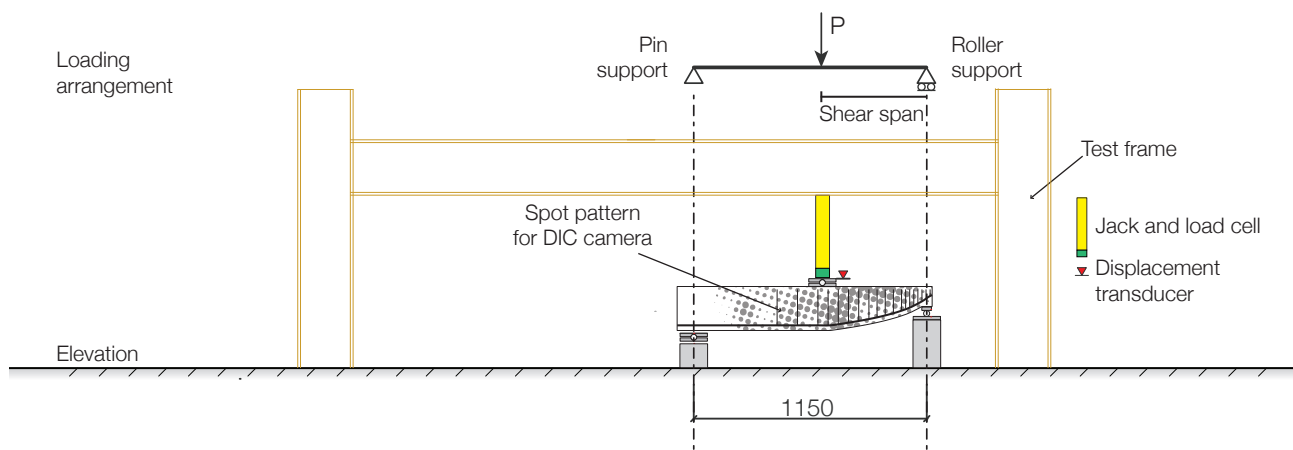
New test set up for Beam 9\_2\_CFP\_M(i).
